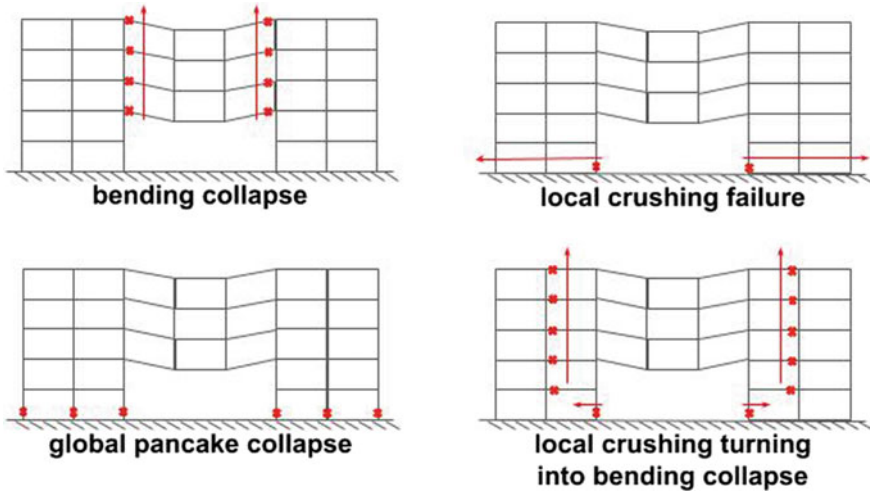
Sketch of regular plane frame collapse mechanisms
